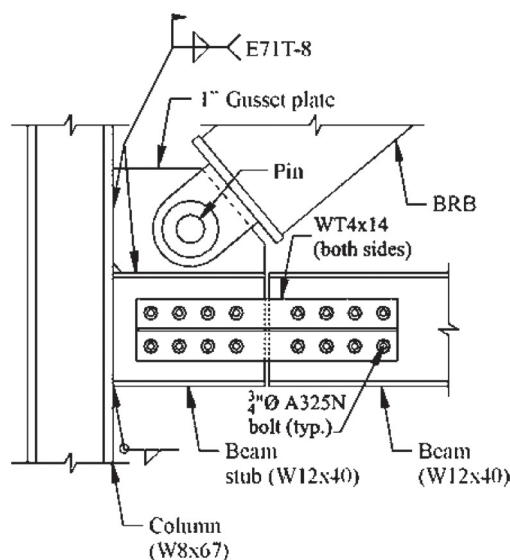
Hinged beam at gusset plate connection [AISC, 2010; from Fahnestock et al., (2006)].
